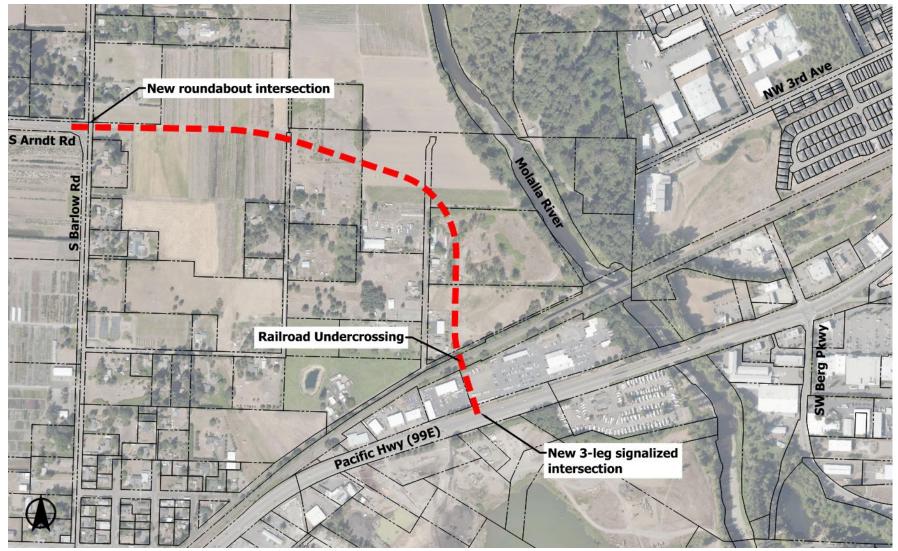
Long-Term Arndt Road Extension Alignment Alternative 1
